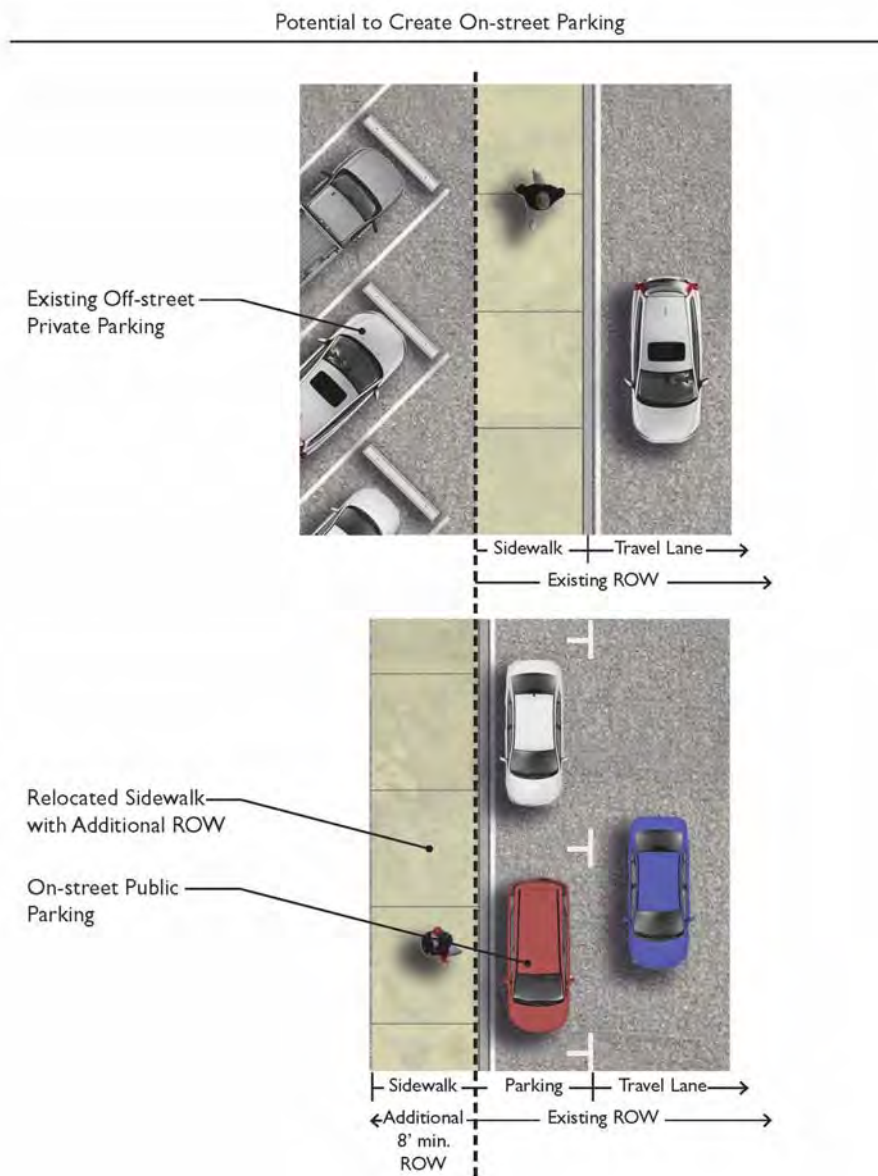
Conceptual Illustration of On-Street Parking on Willamette Street
